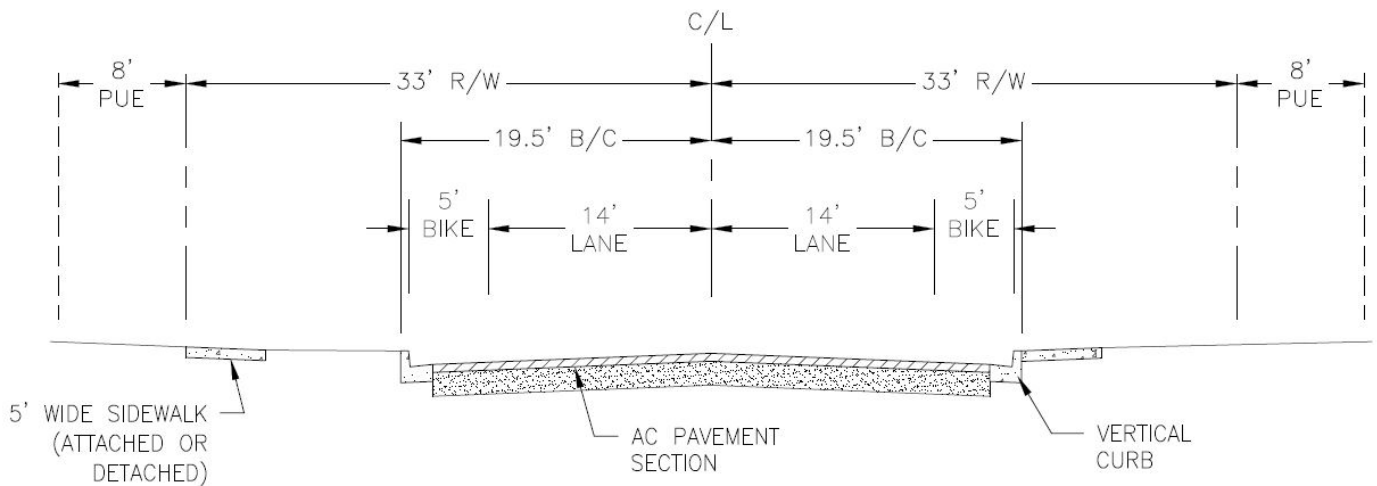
Minor Collector Street Section – “Pioneer Streets”
